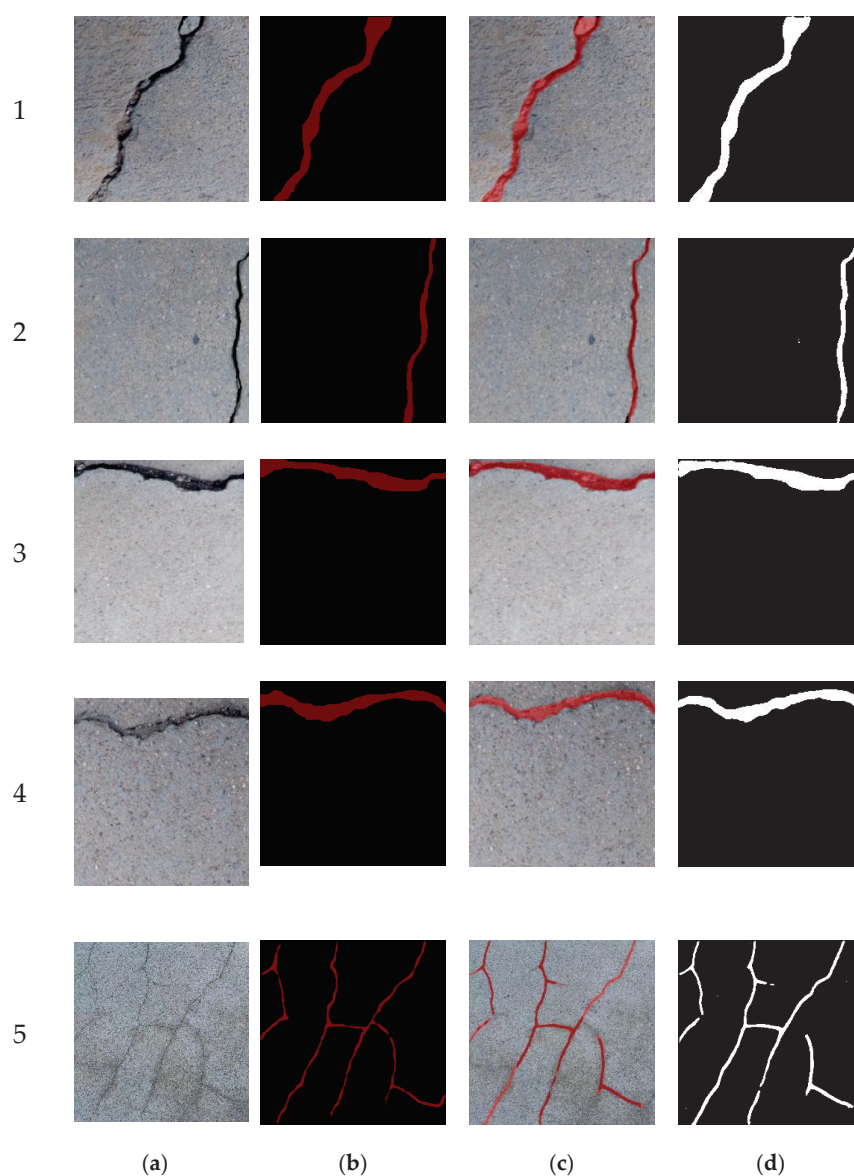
Samples of the crack measurement. (a) Original crack images; (b) manually segmented crack images; (c) segmented crack images with original background; and (d) segmented crack images. 1: Diagonal crack, 2–4: Linear cracks and 5: eticular crack.
